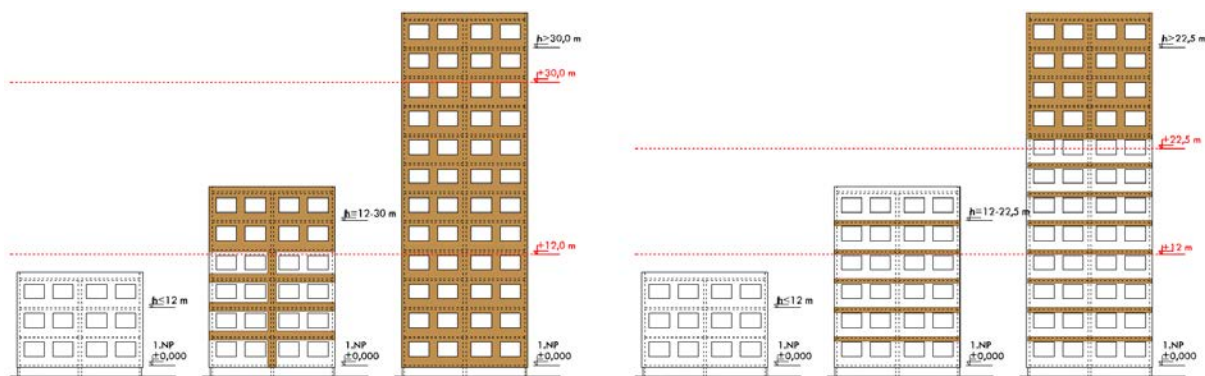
Requirements for ETICS in the Czech Republic for newly built structures (left) and additional insulation of existing structures (right)
